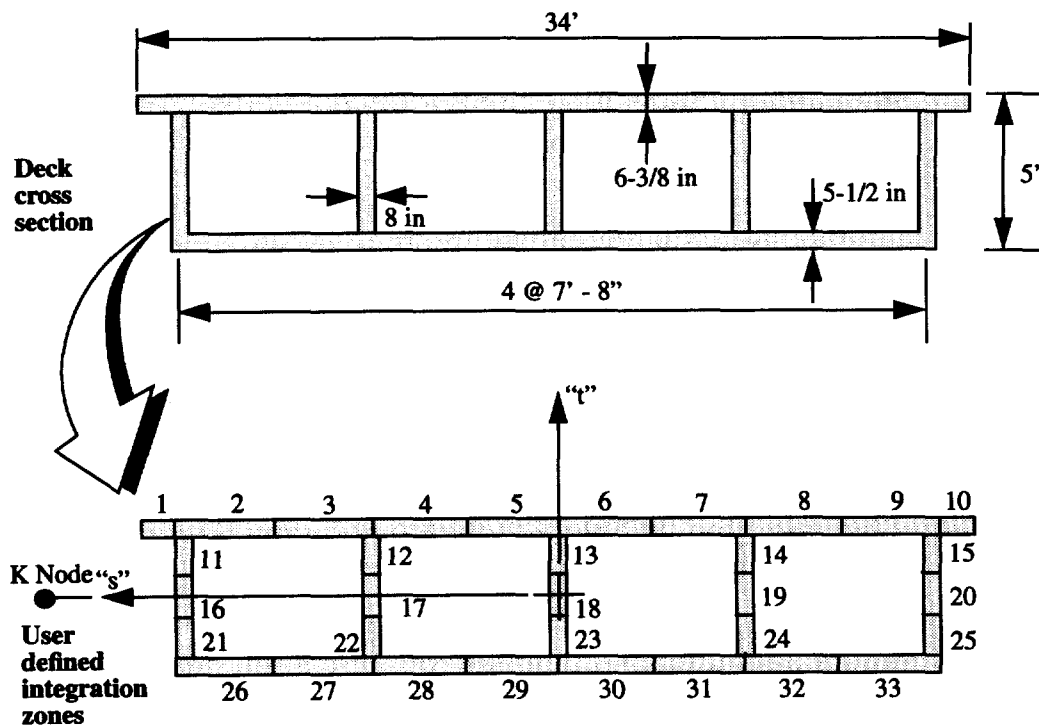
Box girder deck section and user defined cross section integration zones.
